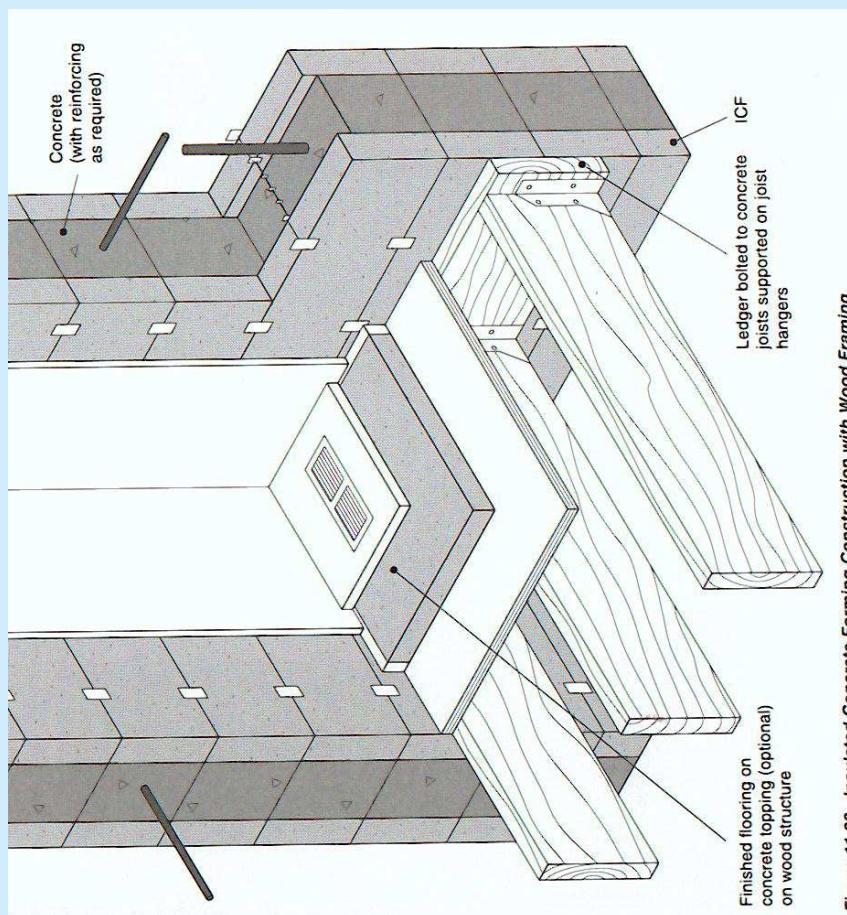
Insulated Concrete Forming Construction with Wood Framing
